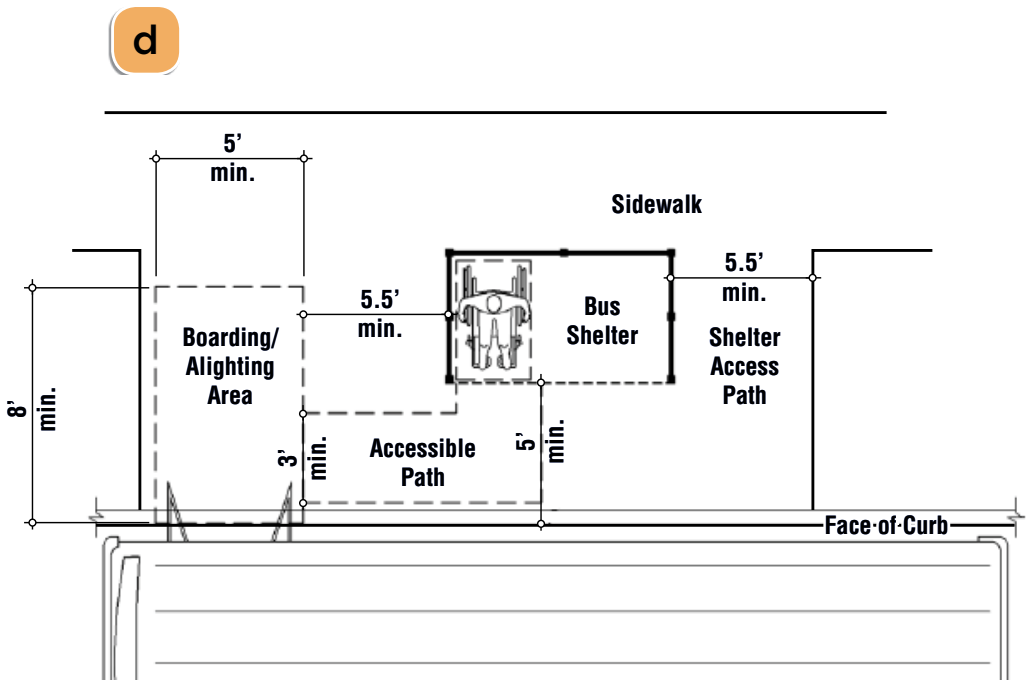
Minimum Station Dimensions from Pace Transit Supportive Guidelines
